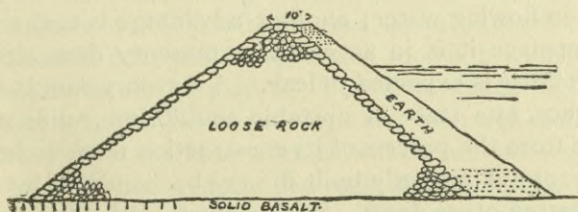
CROSS-SECTION OF IDAHO DAM.
